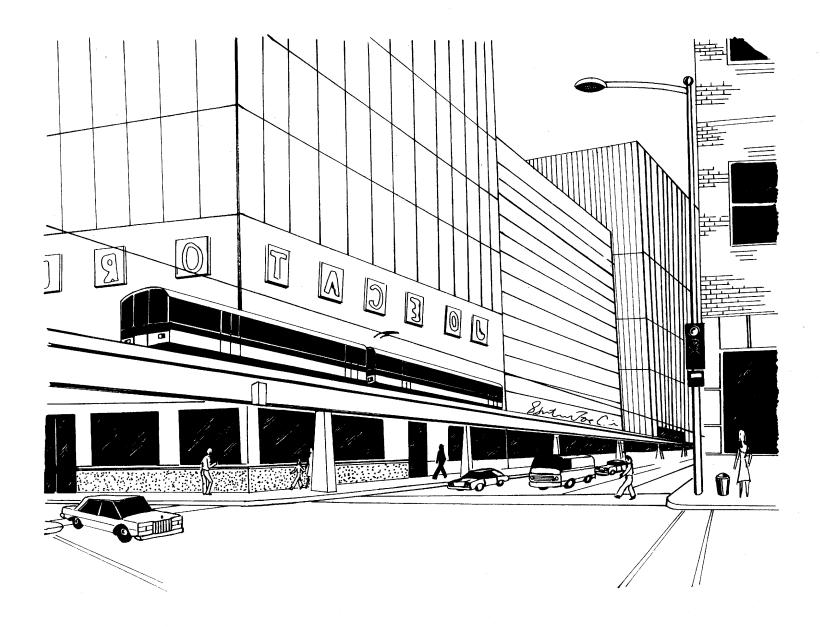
Concept of Elevated Structure With Stations Internal to Adjacent Buildings
